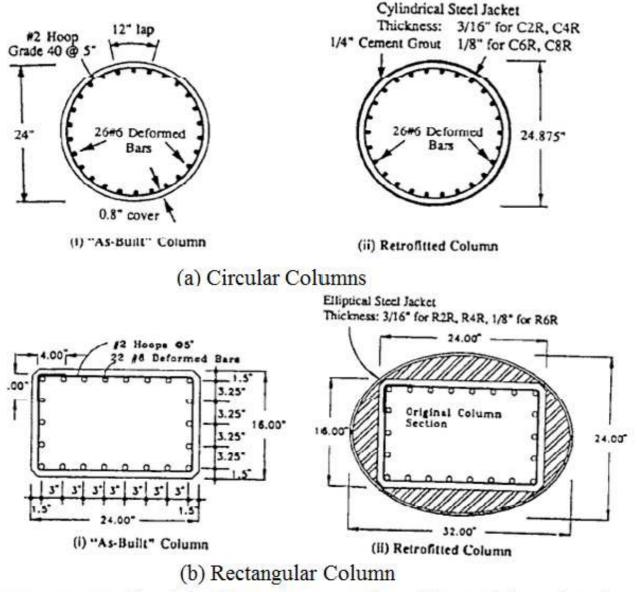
Retrofit of circular and Rectangular Column with Steel Jackets (Priestley et al, 1994, 1994a)
